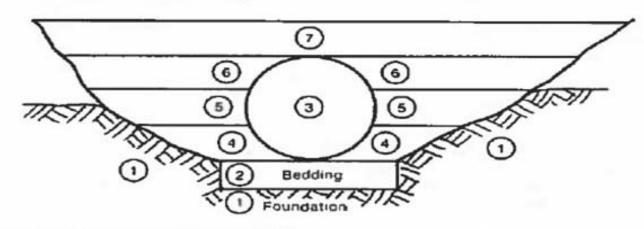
Typical inspector's document for construction control of large corrugated steel pipe structures.
